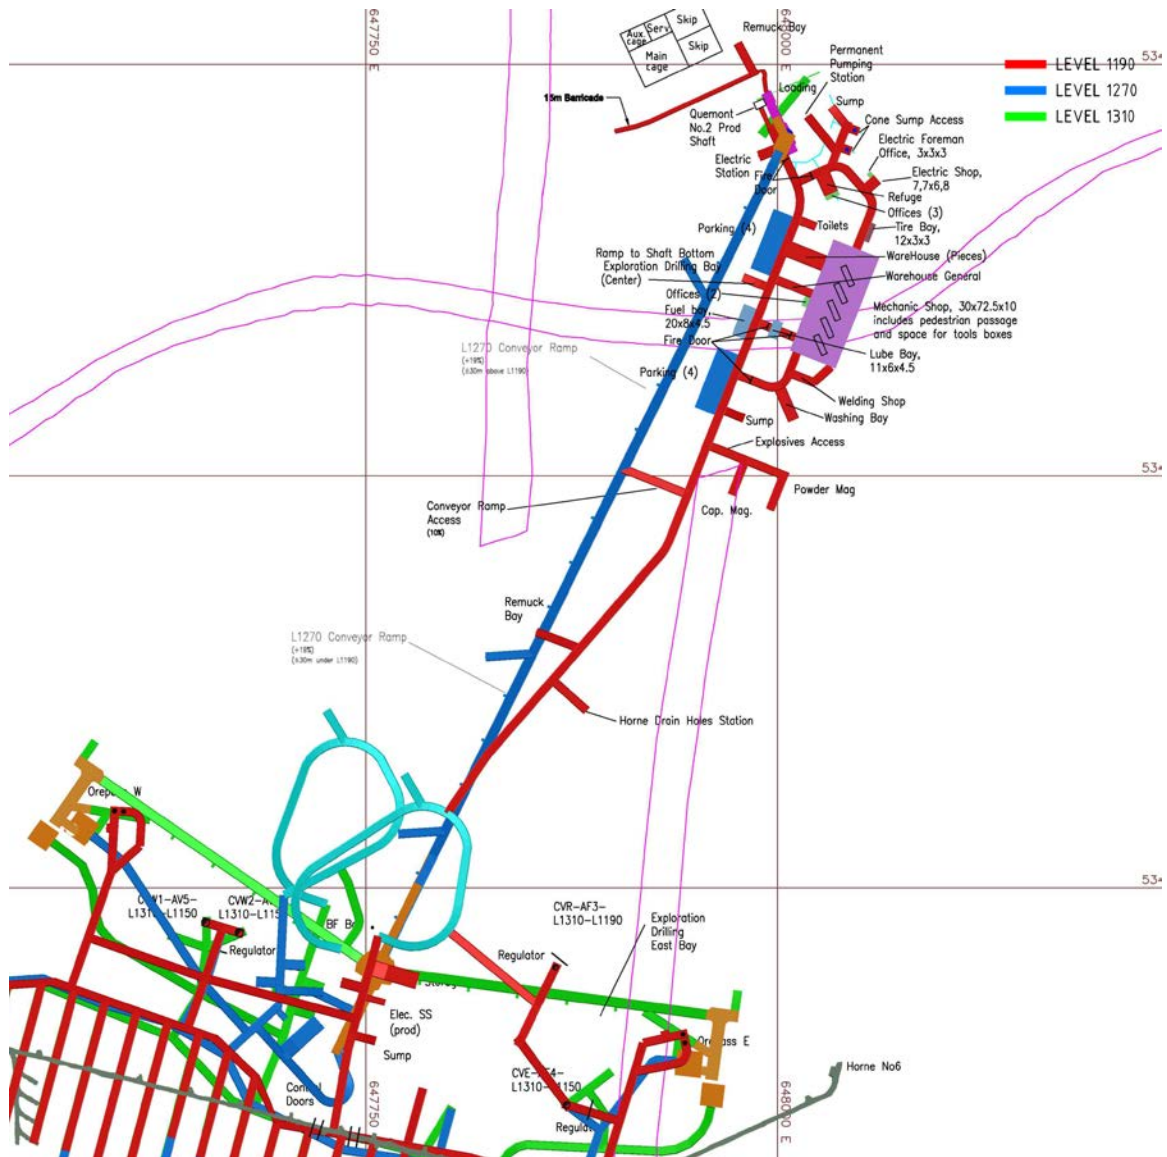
Material handling infrastructure – Plan view Phase 1
